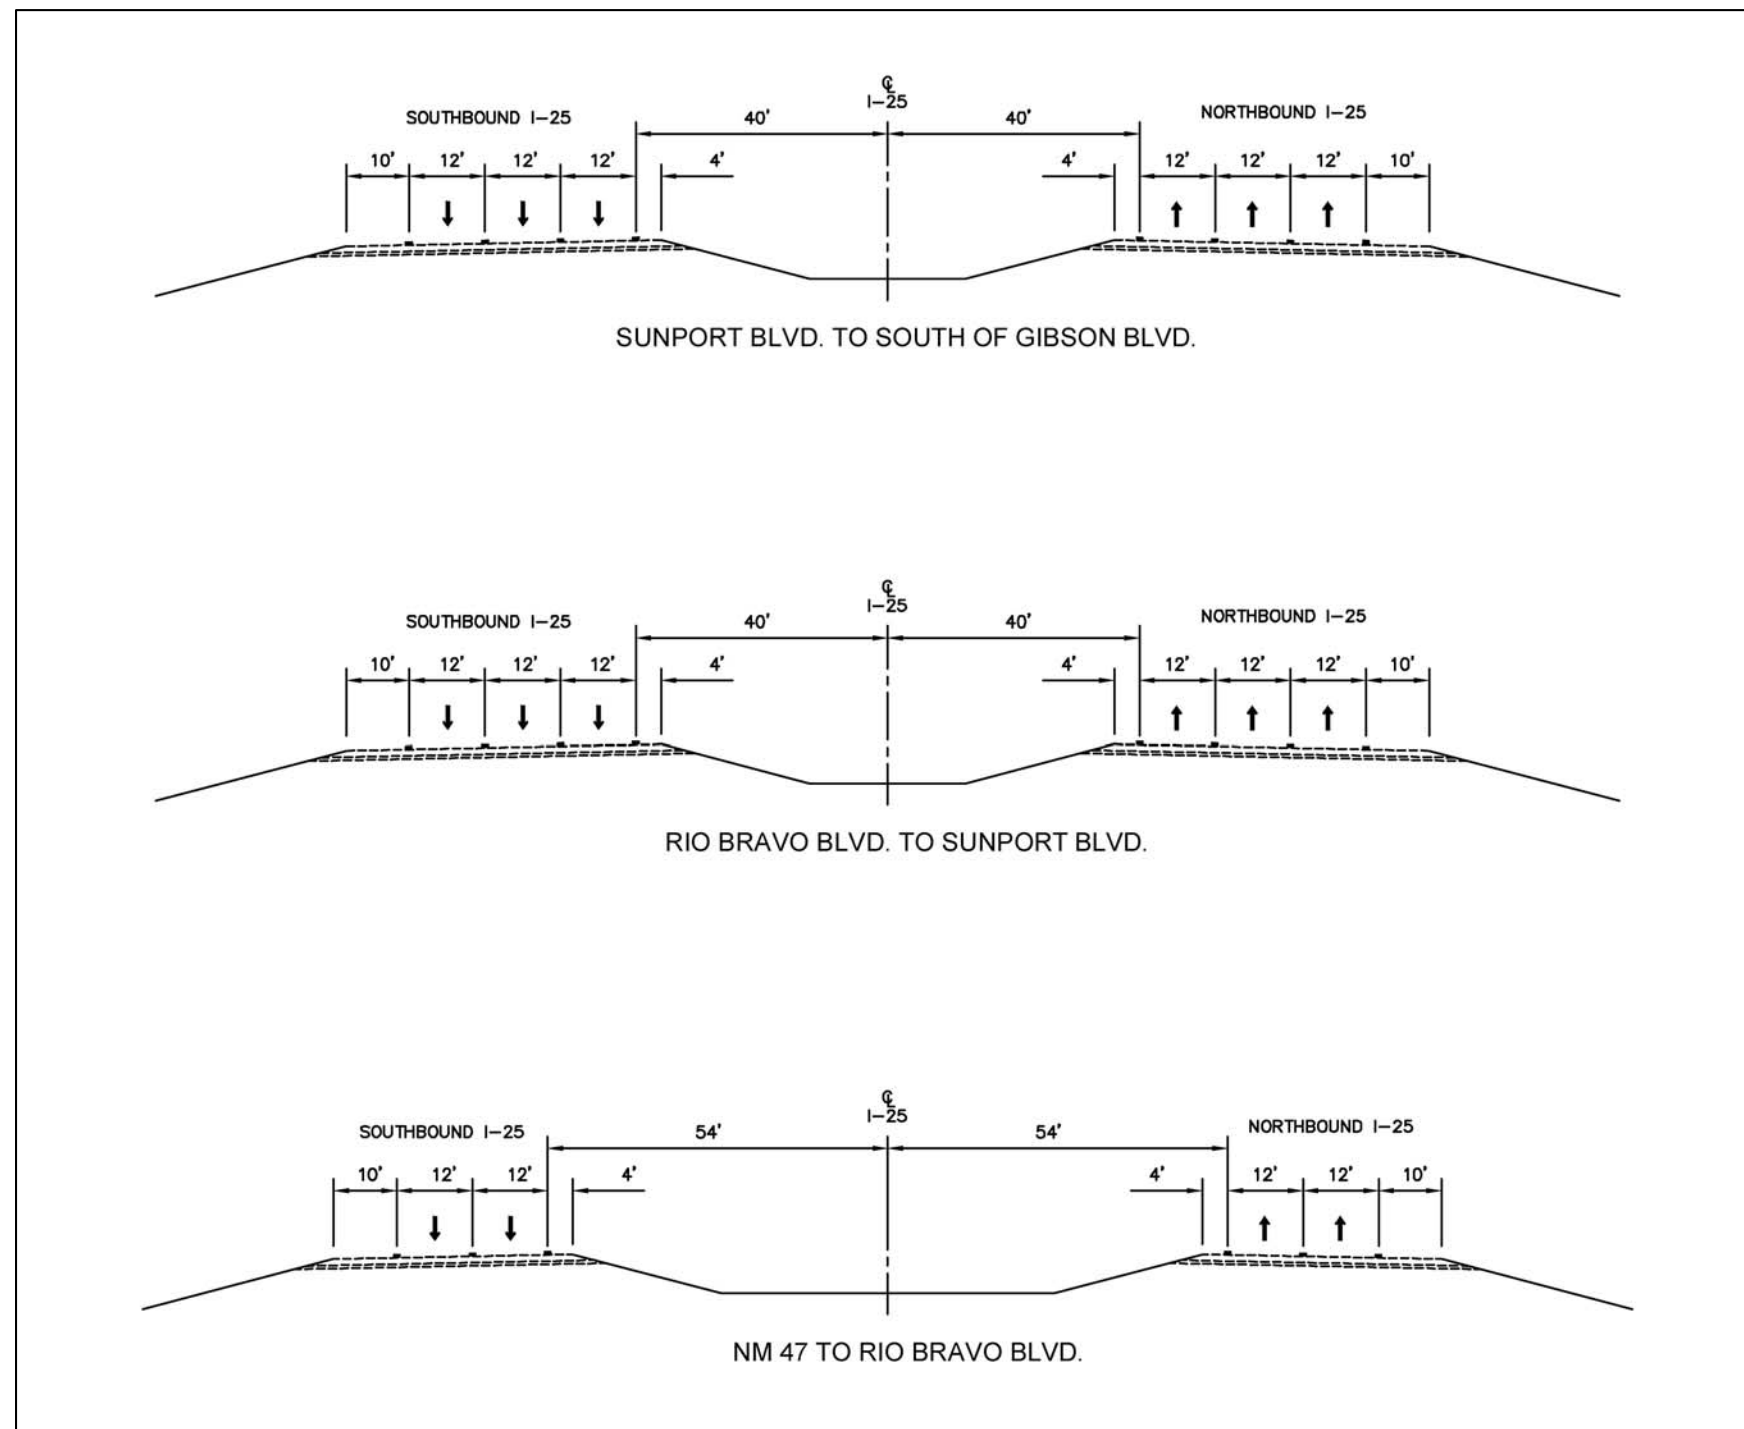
, Existing Condition and No Build Alternative Typical Sections (continued)
